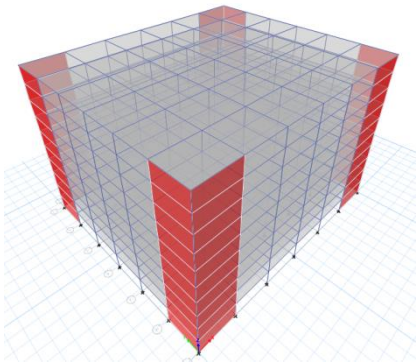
3D Plane of Model-05 [SWP-04]
